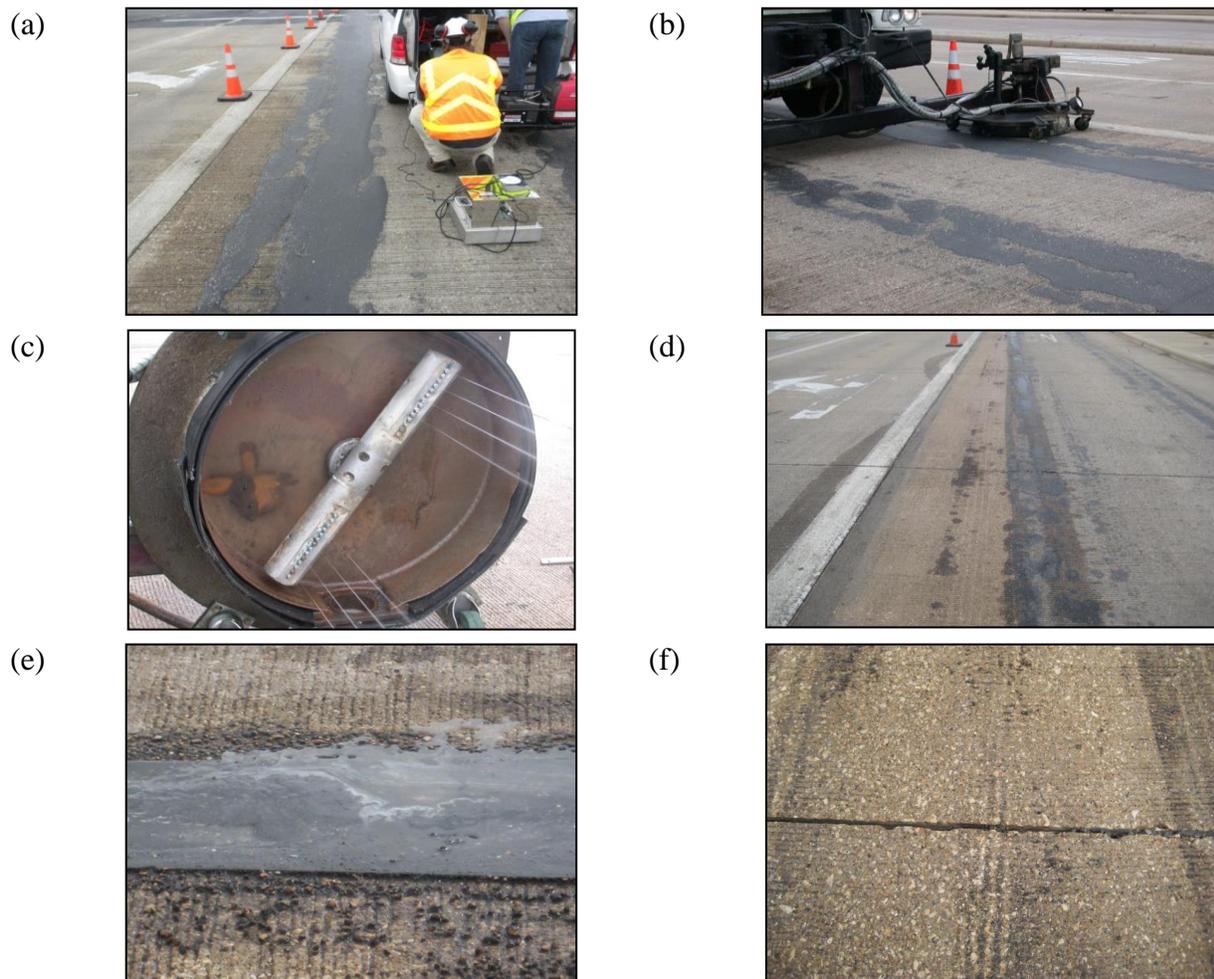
Test pavement pictures from Bryan District concrete pavement section where tracked asphalt was removed using UHP water cutter (a) tracked asphalt on inside wheel path; (b) removal of tracked asphalt using UHP water cutter; (c) 8-nozzle configuration used in spray
